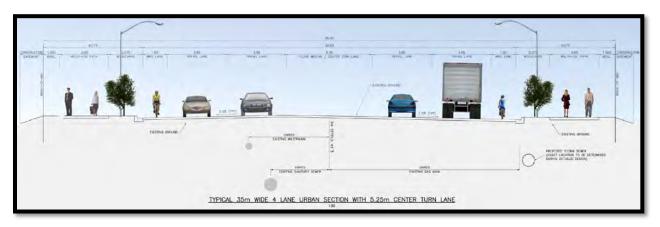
Typical Cross Section – Steeles Avenue Class EA
